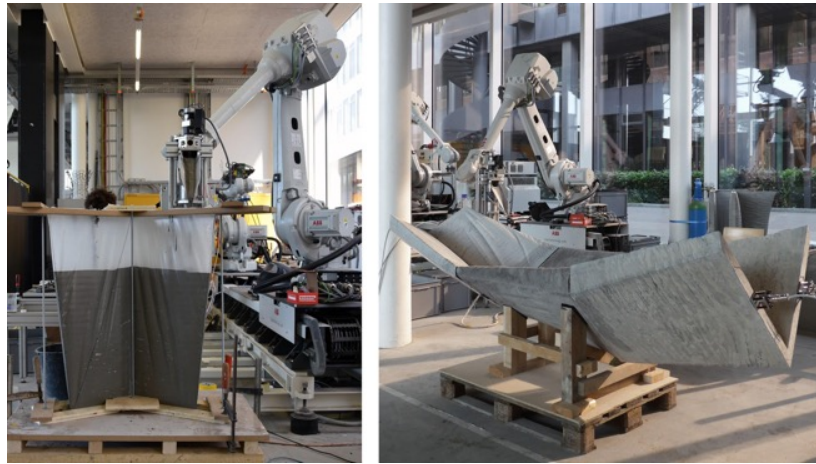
Digital casting of a thin folded concrete element into a foil formwork: (left) Filling process of thin PVC formwork; (right) Post-tensioned folded structures Source: [51,52]
